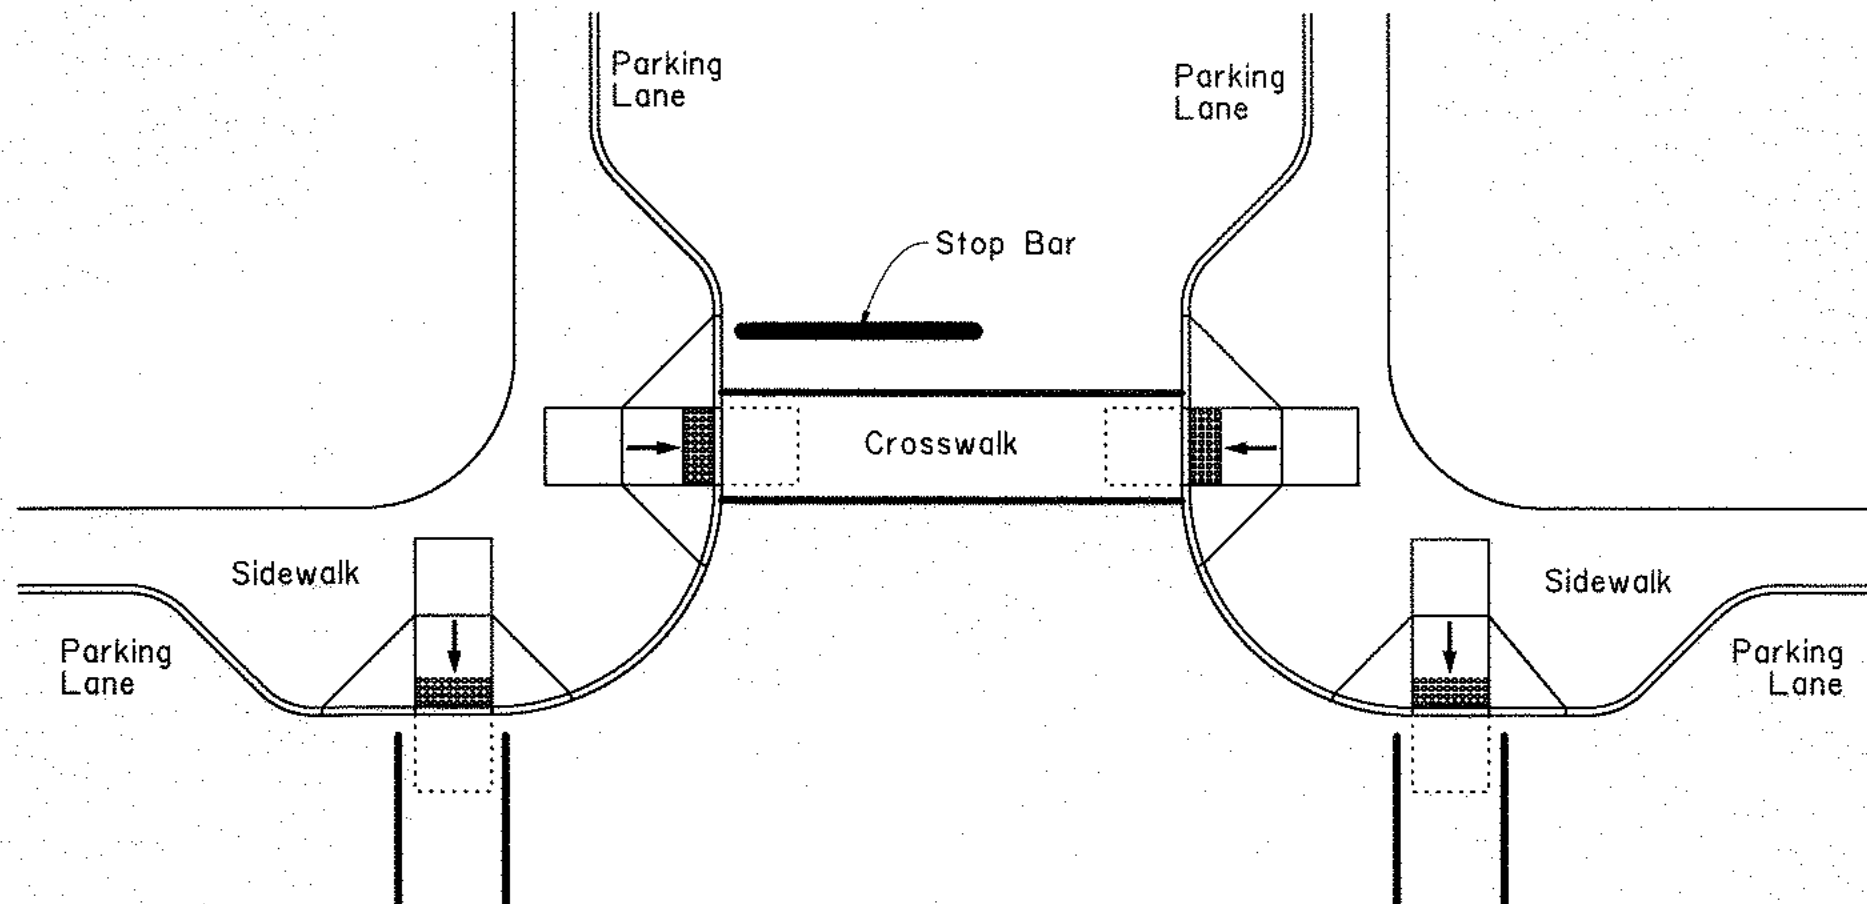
DETAIL A: CURB RAMPS PLACED OUTSIDE THE RADIUS OF A CURVE
